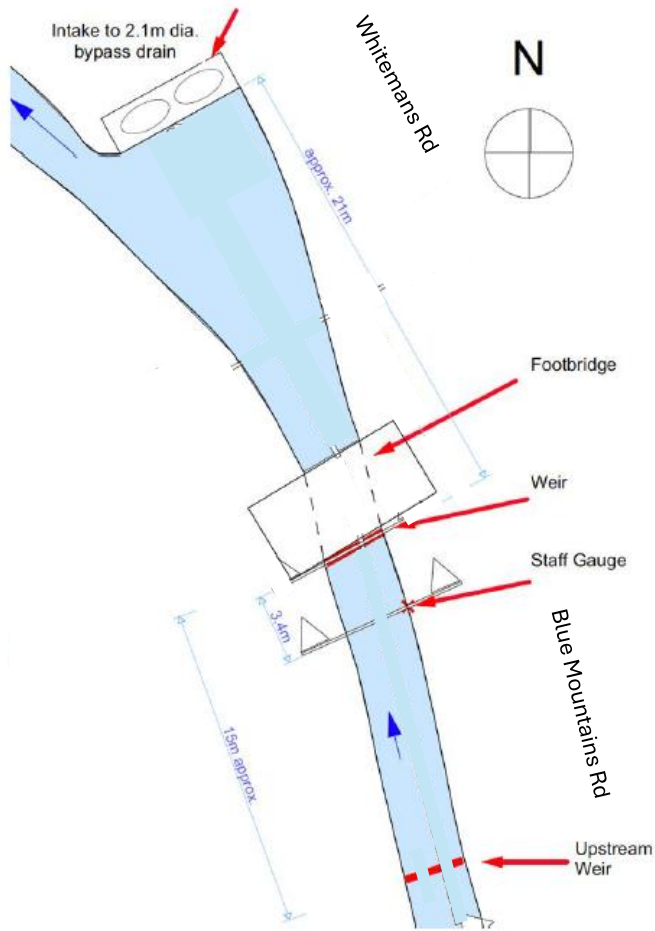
Plan View of Staff Gauge Site, Pinehaven Stream
